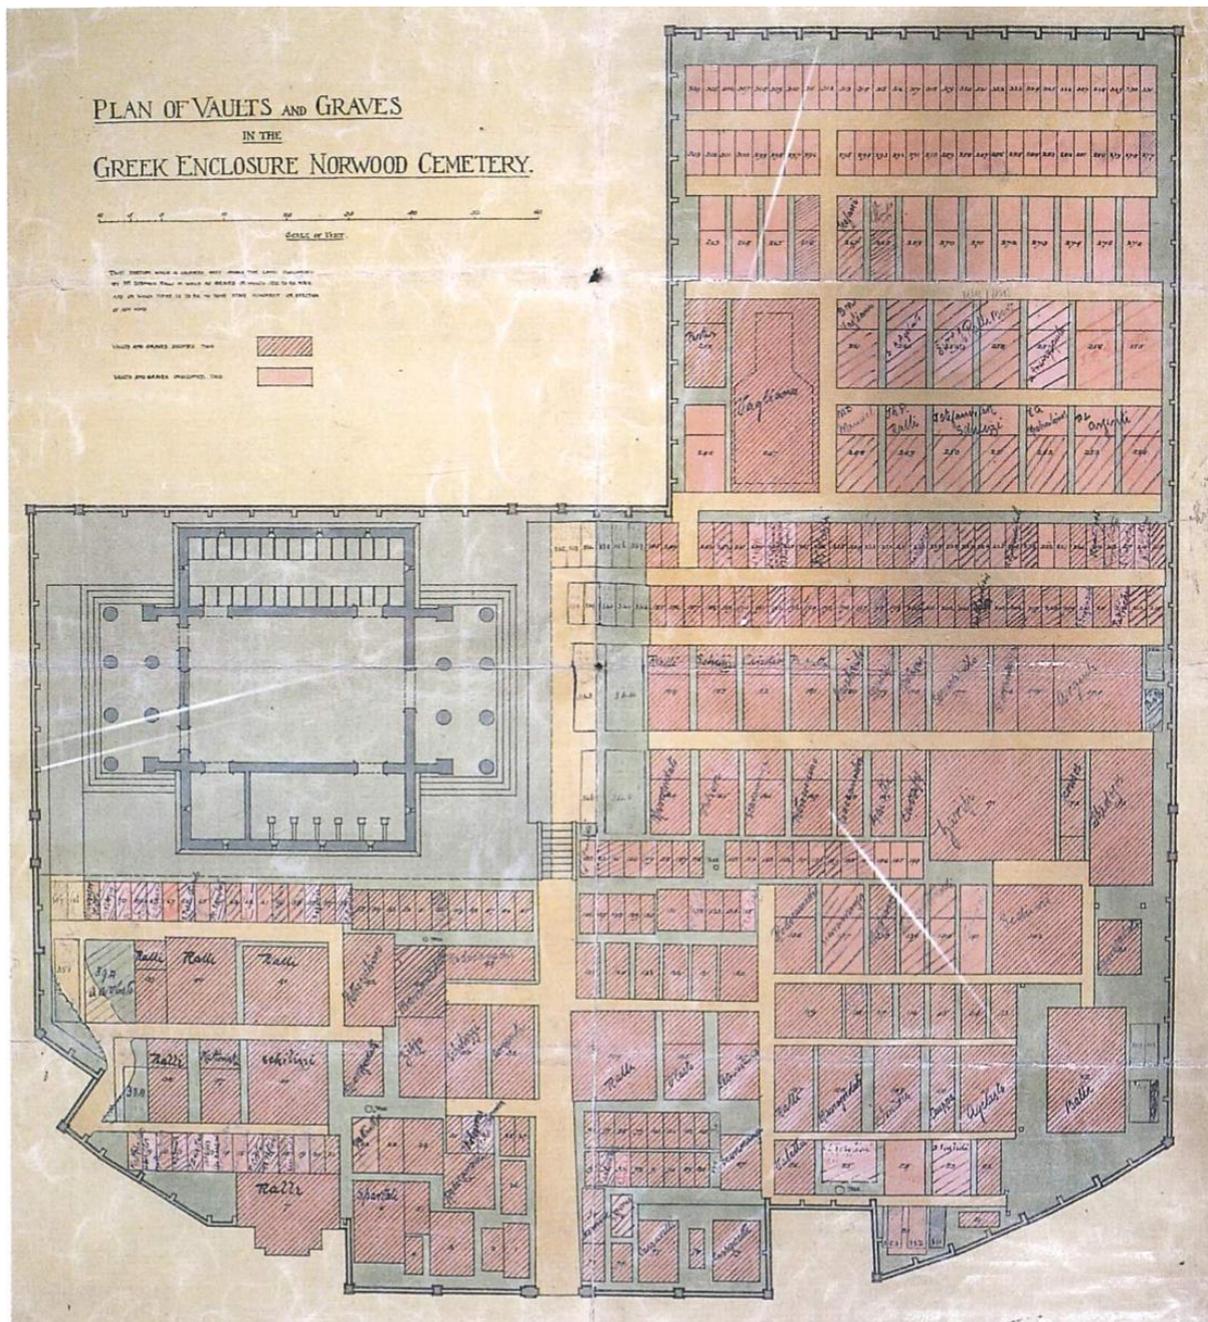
Ground plan for the Greek section at West Norwood Cemetery, designed by Norton & Gregory, London.¹³¹
